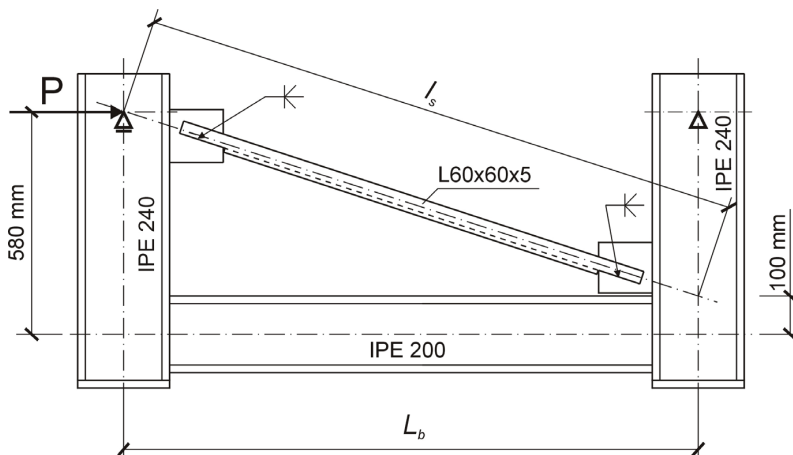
Geometry of portal frame specimens of group WL (side view) [33].
